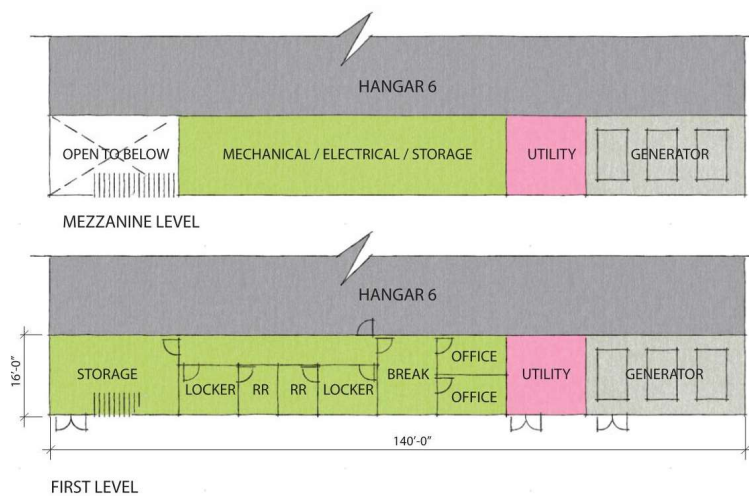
Hangar 6 Aircraft Maintenance (First Floor & Mezzanine Level Floor Plans)
